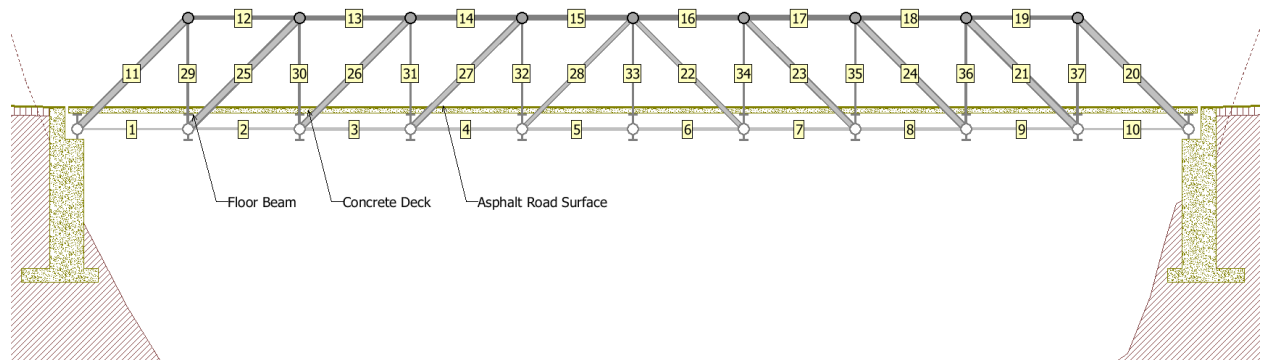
Howe Truss Bridge Model from Bridge Designer 2015
